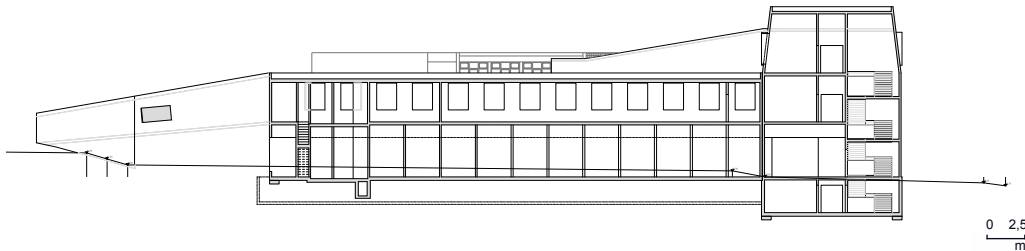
Quinta das Flores School's new building \_ Transversal section through the administrative block
